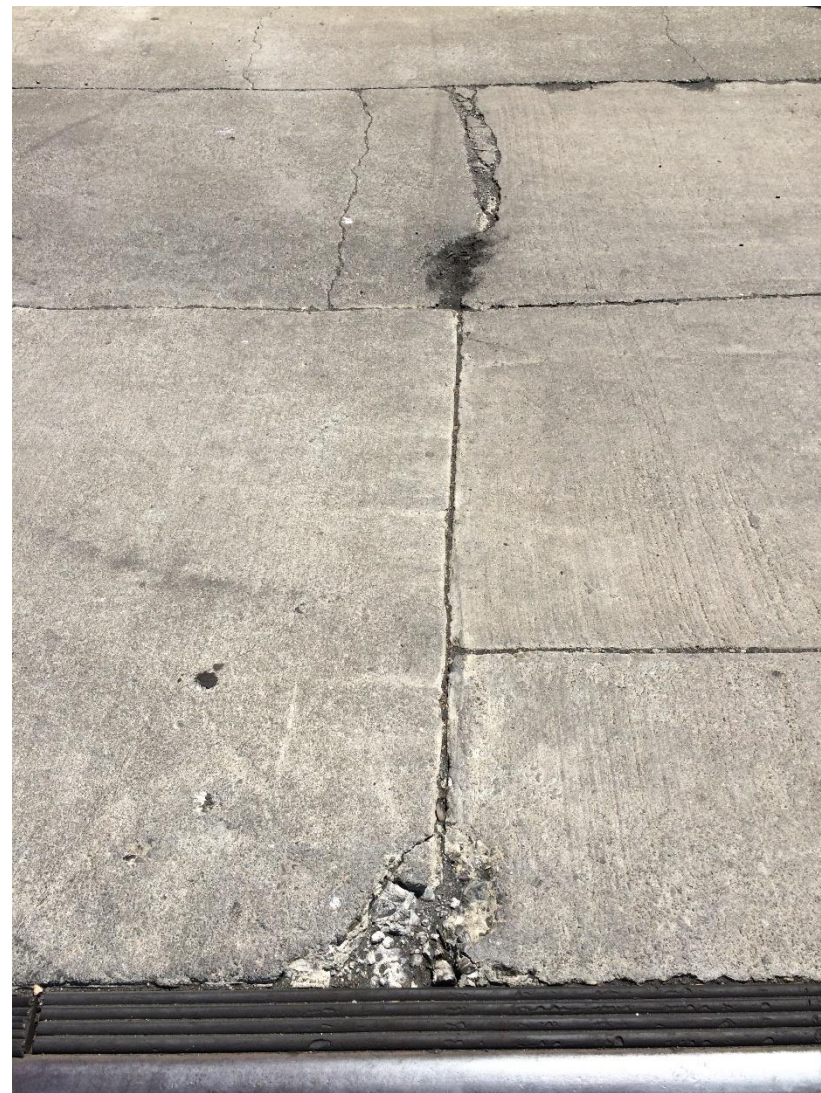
Looking east, north of 5DI-14A: areas of minor concrete deterioration. No change from last year.
